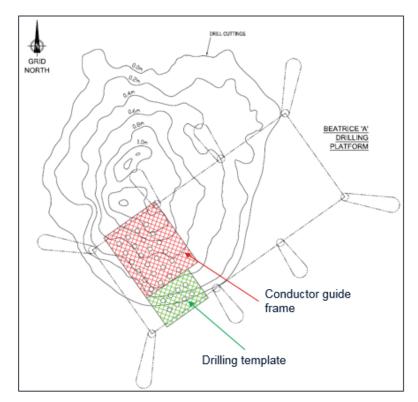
Location of the drill cuttings pile at the AD platform.
